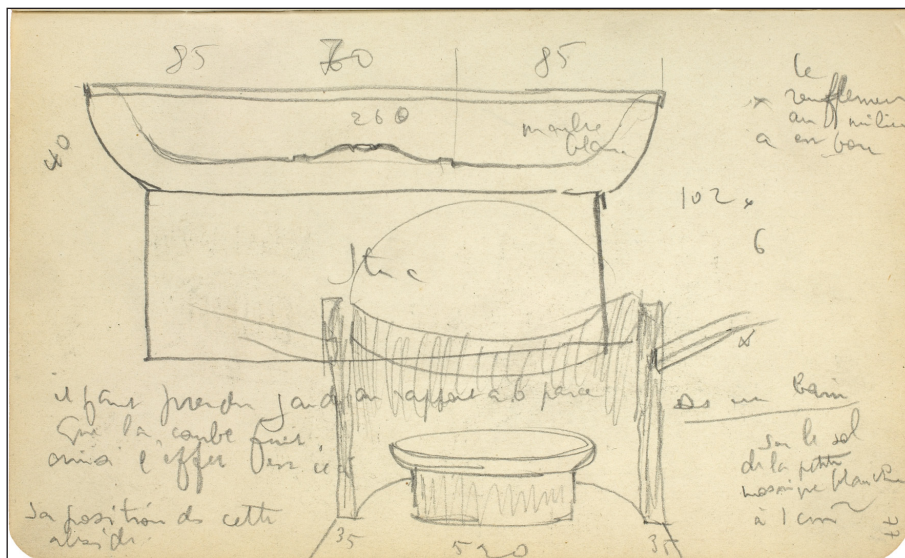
Le Corbusier, sketch of a fountain, Forum Thermes, Pompeii, carnet 4, 1911.
